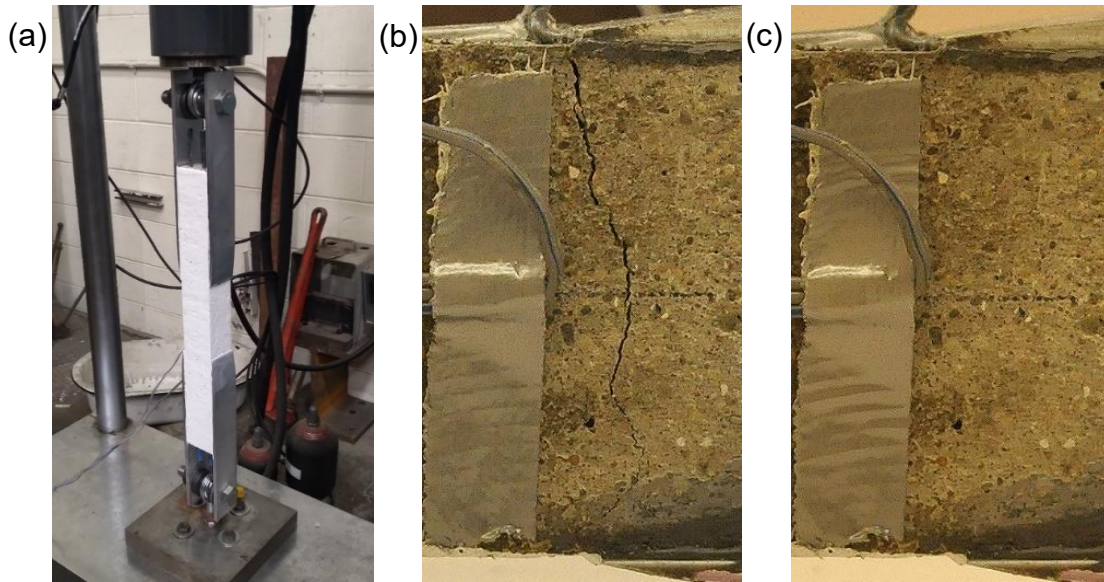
(a) Test setup, (b) crack before healing, and (c) crack after healing
